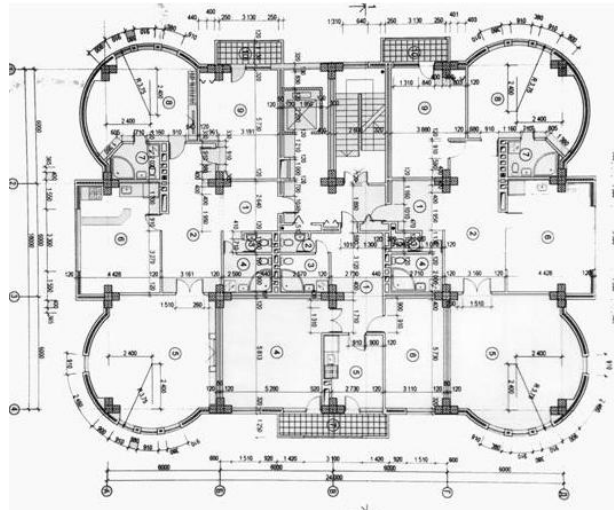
Plan of a single-core residential buildings on Soviet Street (Drawings from the archive of architect O.Baigozhoev and M.Otunchiev).
